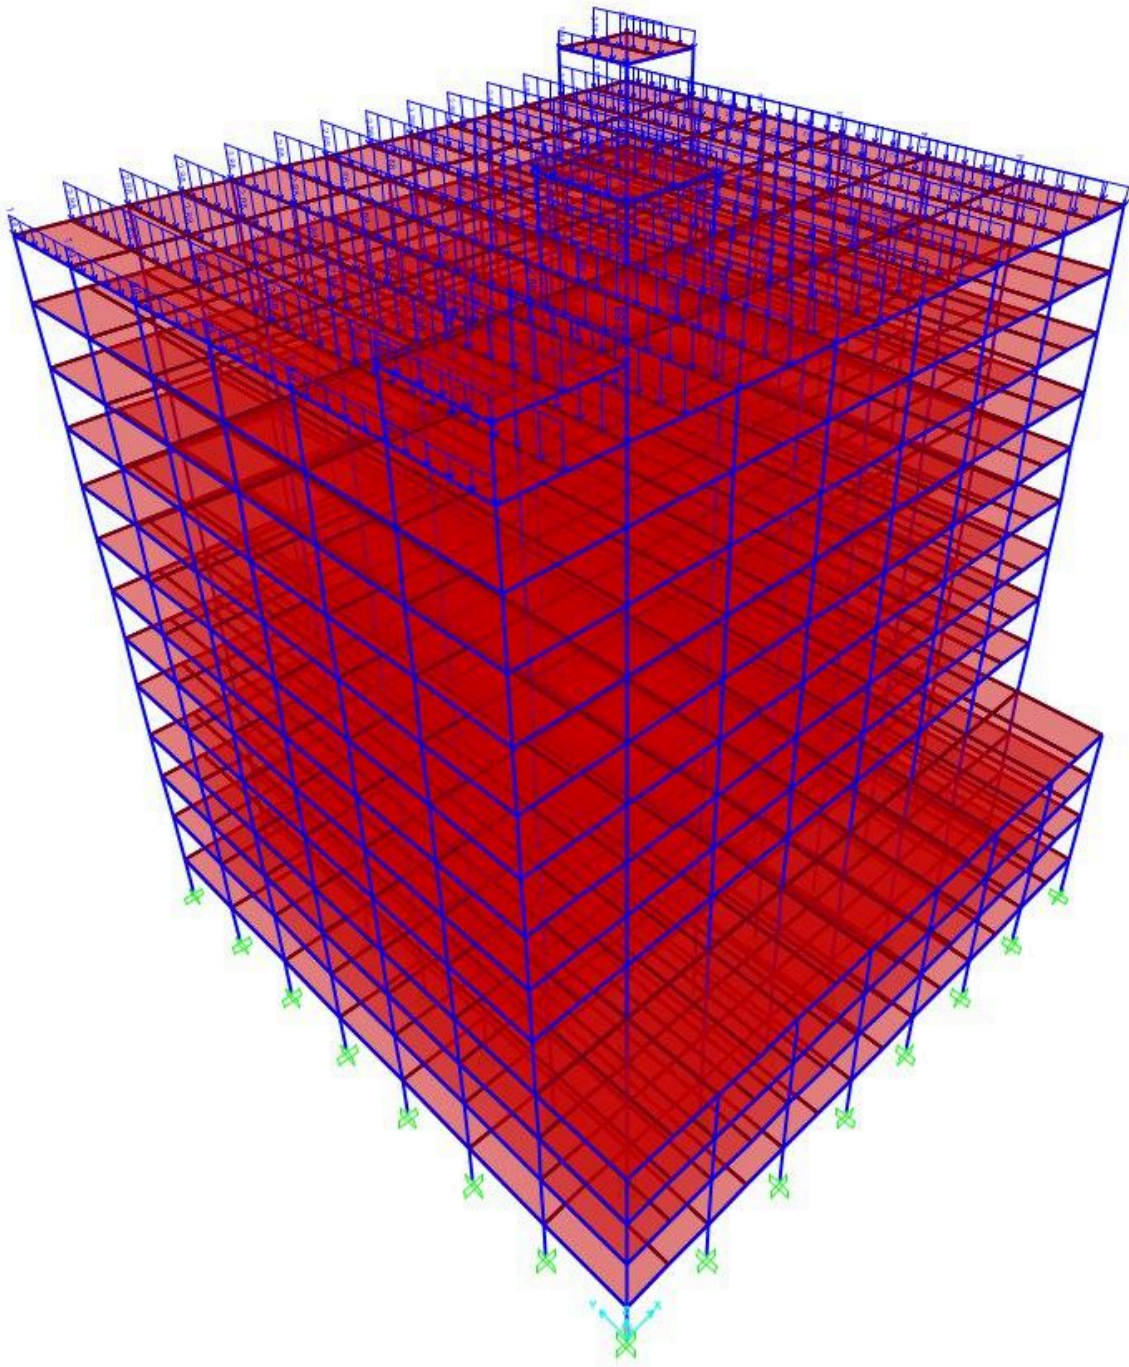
Applied roof frame loads on 3D model in SAP2000
